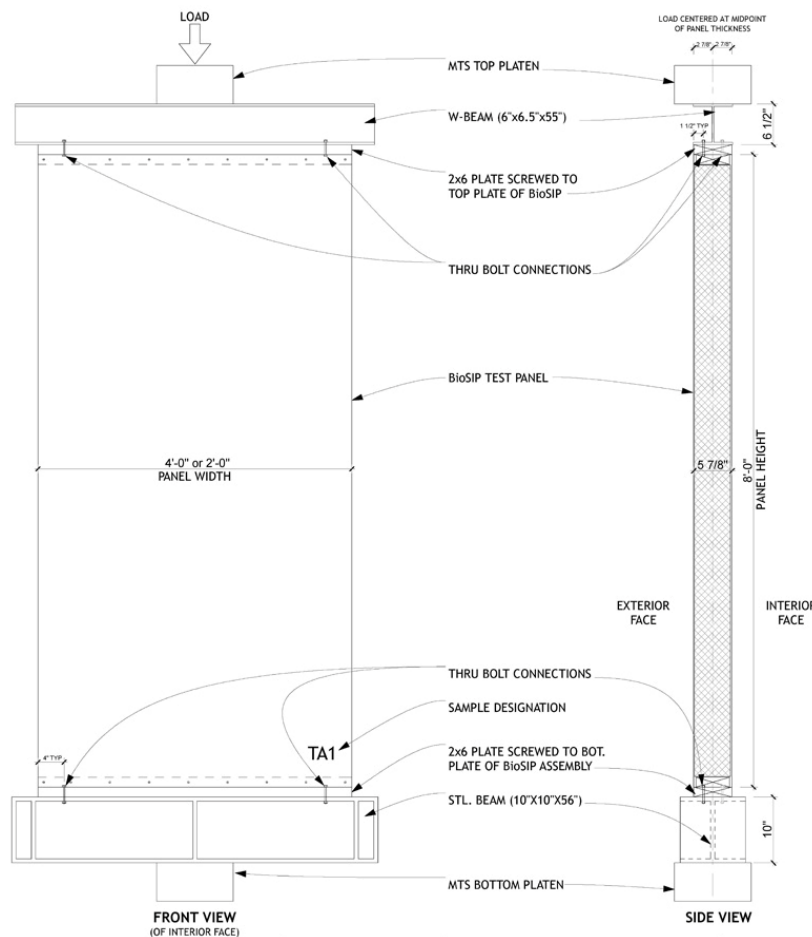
Axonometric drawing depicting Axial Compression Test Setup
